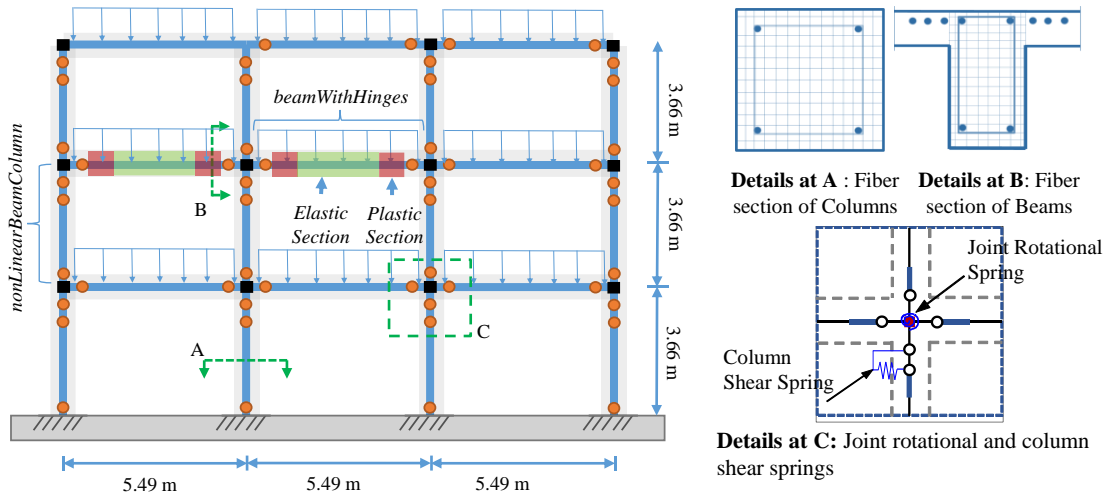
Numerical modeling of the case-study frame highlighting modeling details of columns and beams fiber sections, column shear springs, and joint rotational springs
